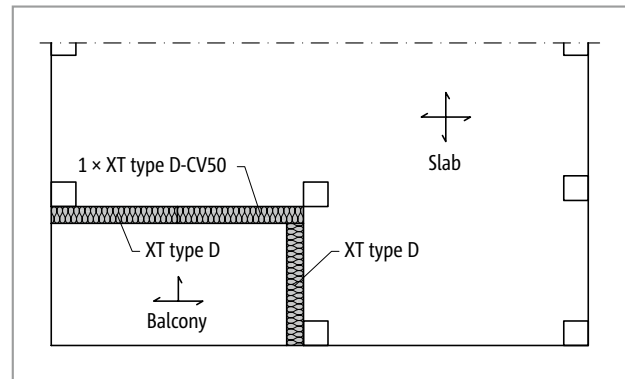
Schöck Isokorb® XT type D: Two-way spanning
